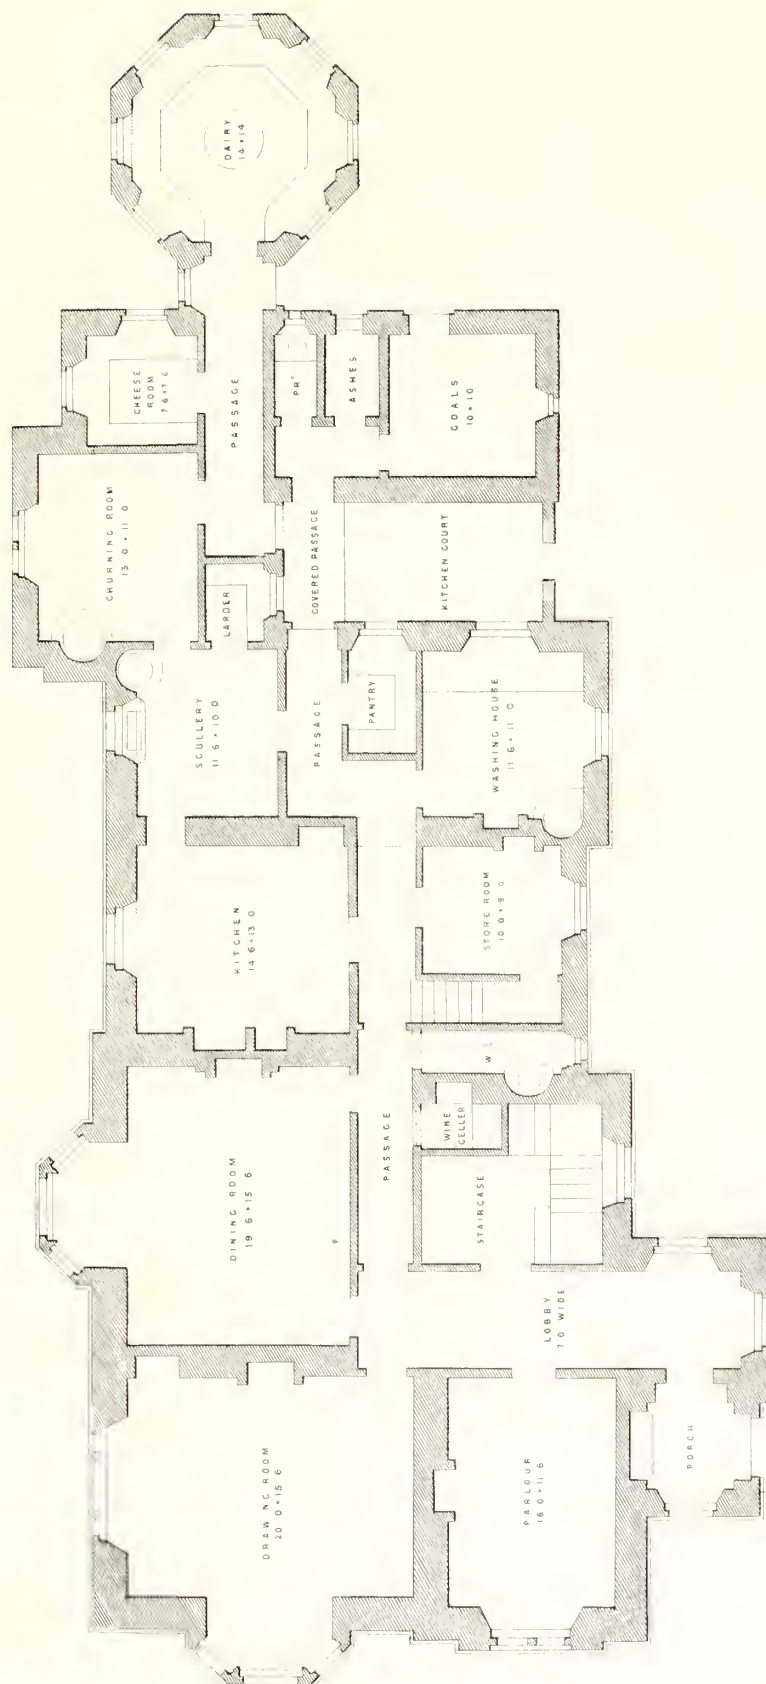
PLATES XXXVI. to XXXVIII.—DESIGN FOR A FACTOR'S HOUSE.
